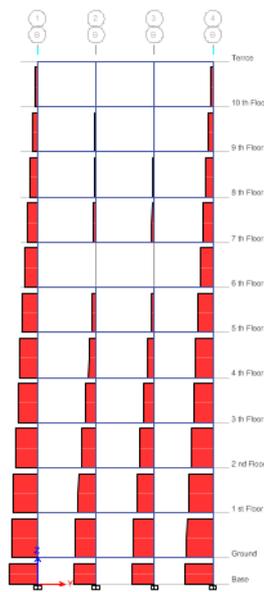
Transfer girder at 7<sup>th</sup> floor
